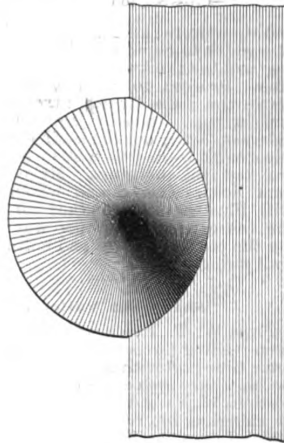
Plan of Conical Roof Intersecting a Plain Roof of Different Pitch.
